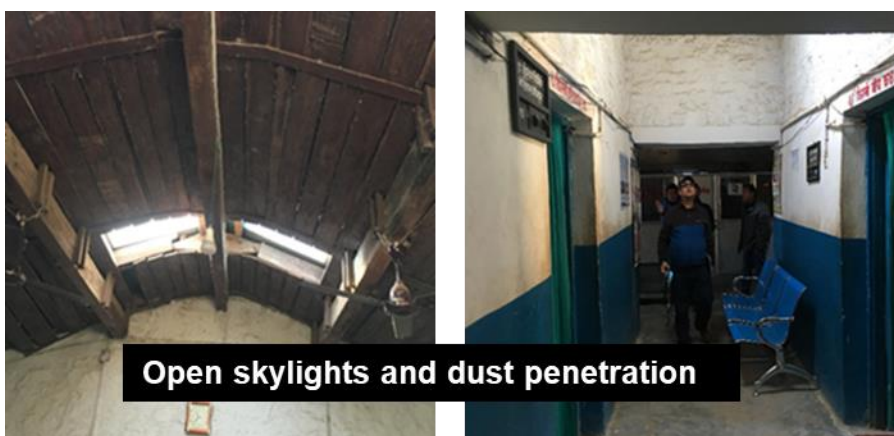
Dust, dirt and insects access through roof cracks
